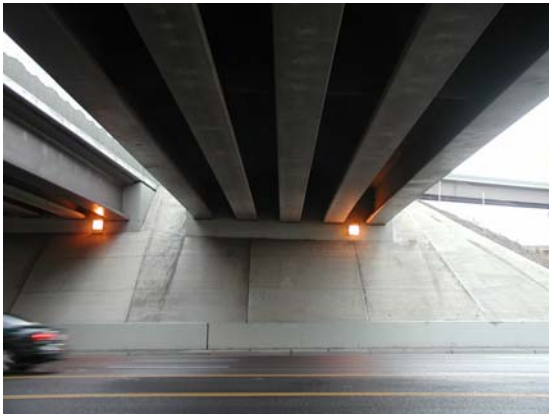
Typical Photos of Bridge #702, I-15 South Bound Collector over 7200 South.
